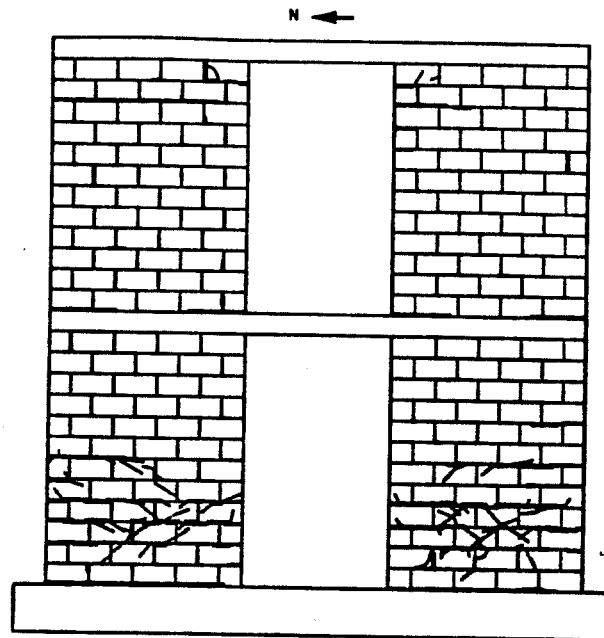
Sp. 2a: Progression of Wall Cracking at Load Point 361
